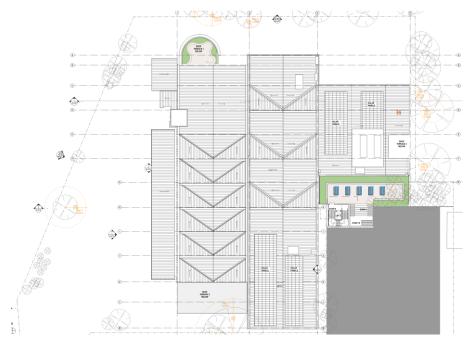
Proposed Development Plan (Stage 3). Source: TZG Architects.
